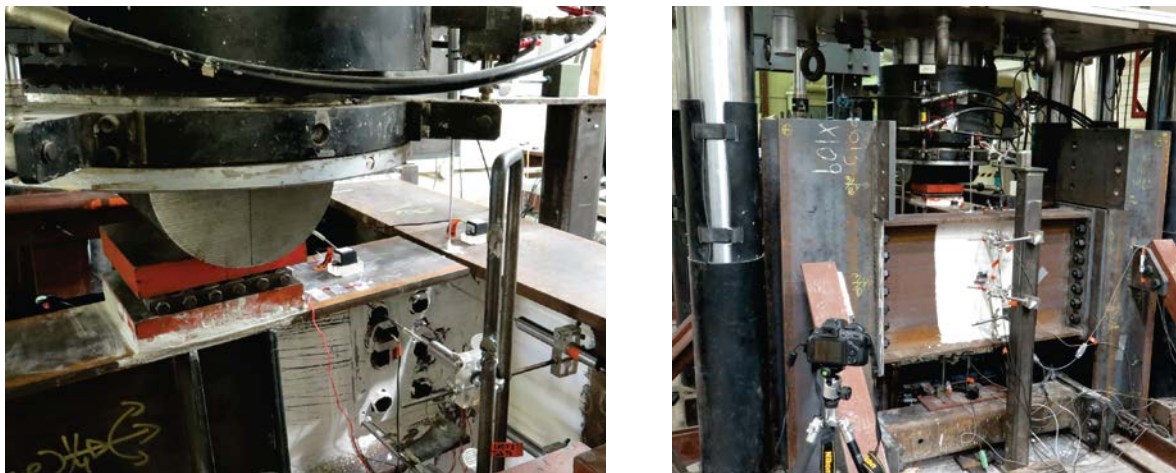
Laboratory test of beam-to-girder shear tab specimen BG3-2-13-F
